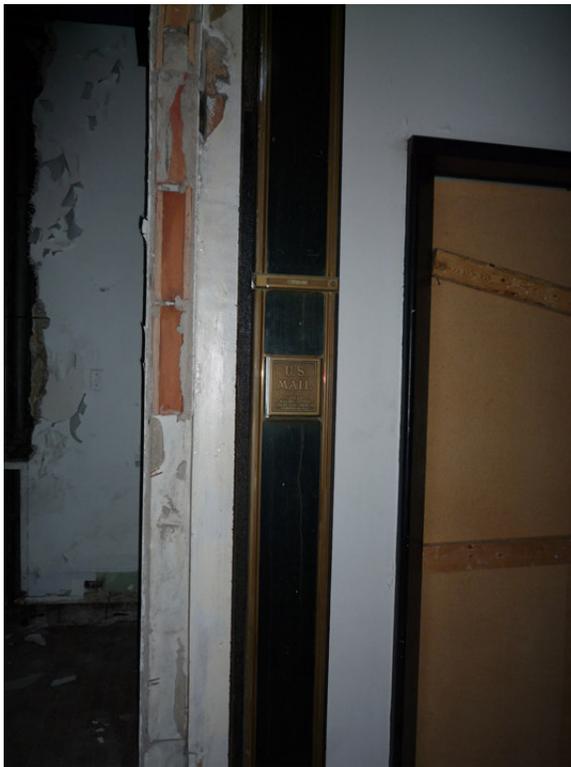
Mail chute next to elevators, typical of floors 1 through 15.
